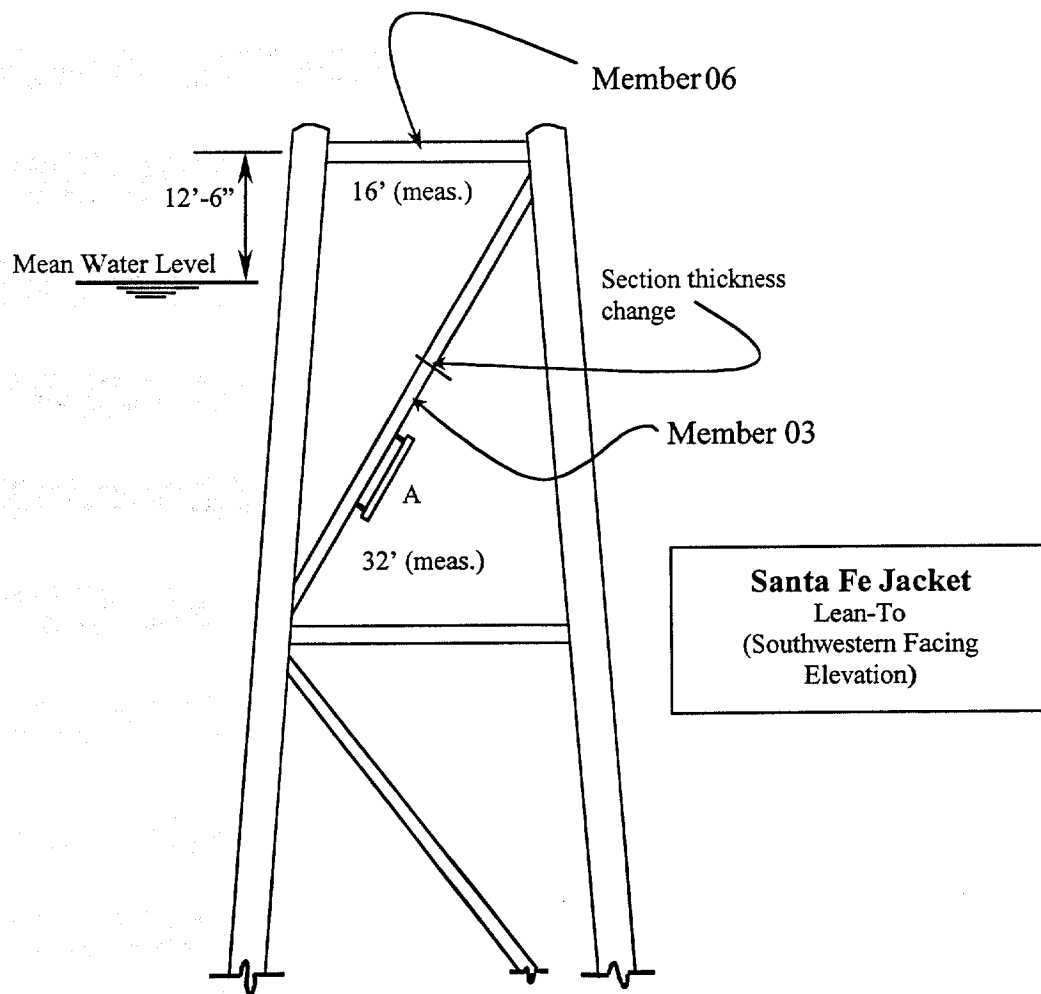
Santa Fe Lean-to Structure Schematic Drawing
